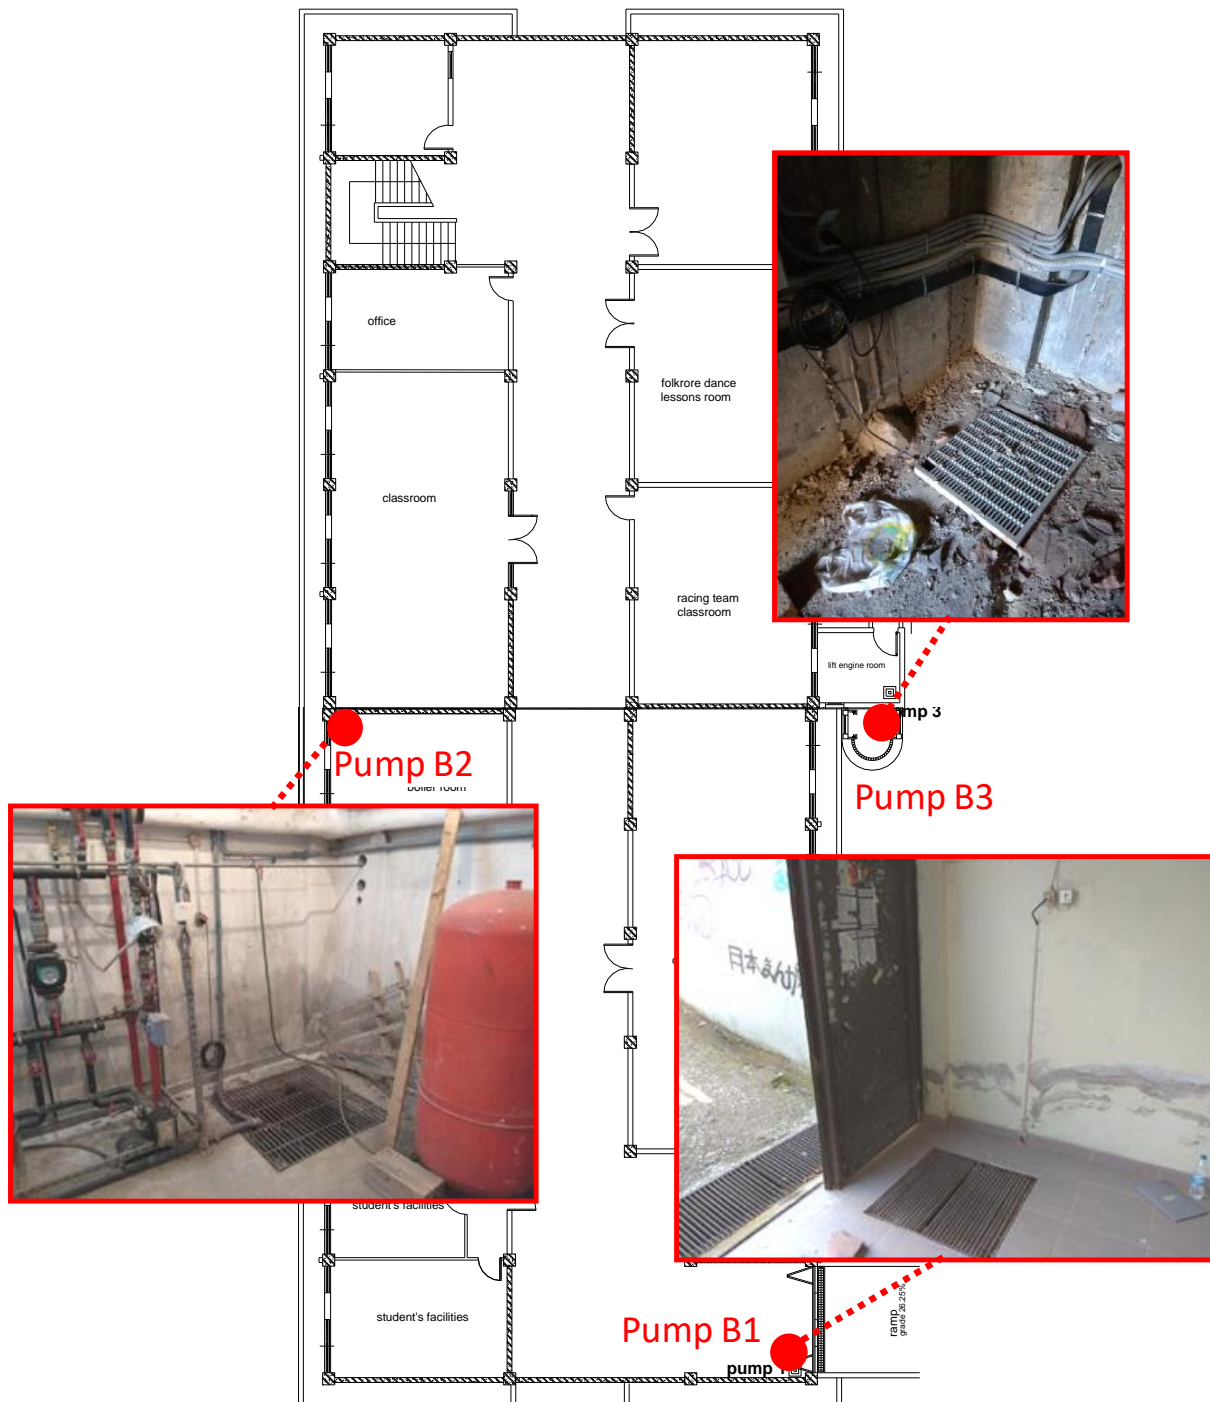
Position of existing water pumps at the basement level of Building B (Pump B1 near the ramp entrance, Pump B2 inside the boiler room and Pump B3 under the elevator).
